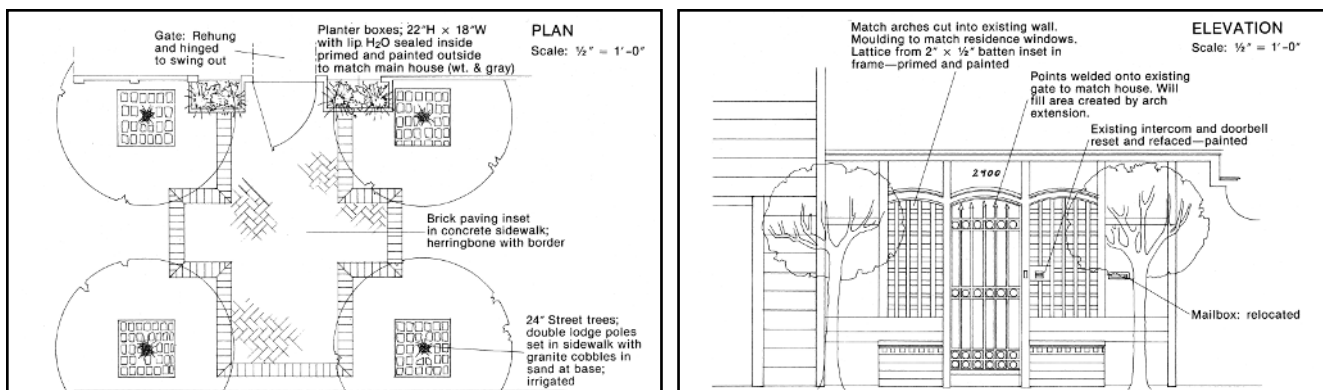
Hardscape plan and elevation at garden entry — Thornton residence in San Francisco, CA. The hardscape plan shows the changes to the street access and the new planting and entrance structure. Elevations and sections show style and detailing. This decorative information never shows on plans. Landscape Design: Magrane Latker Landscape Design; Drawing: Lezlie Johannessen.
